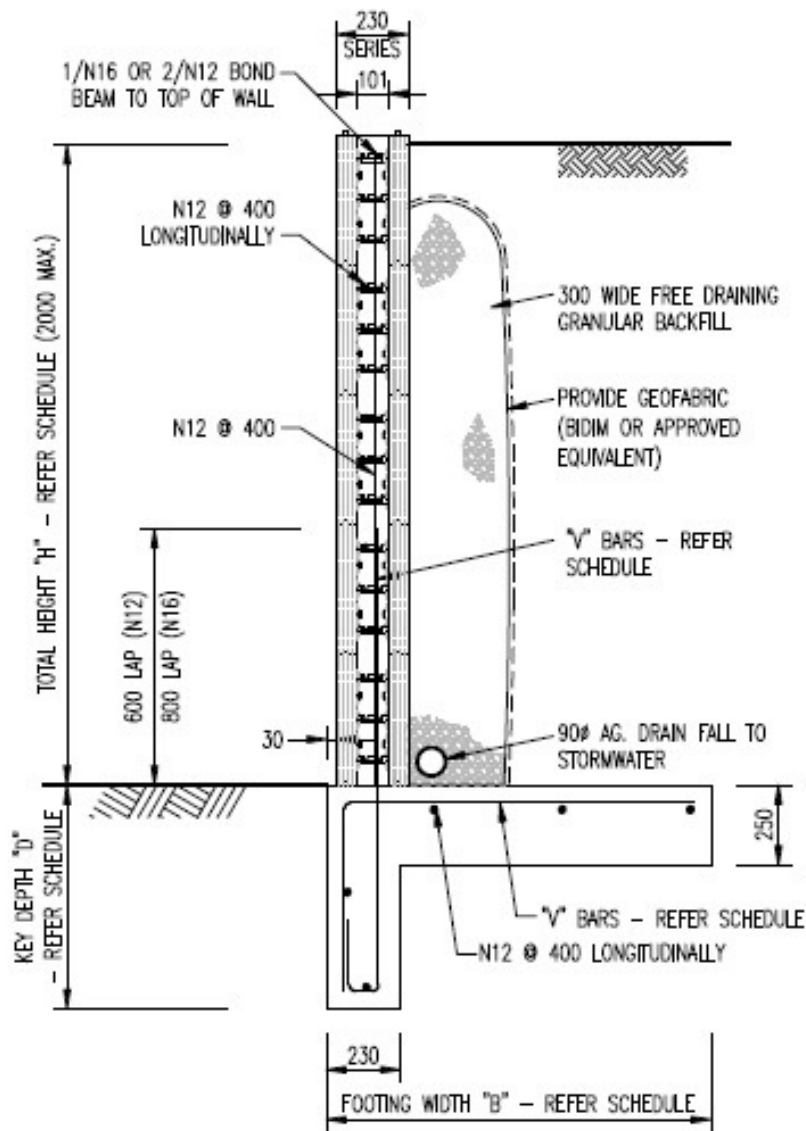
1200 – 2000 High Retaining Wall (230 Series Panels) Low Side Footing
